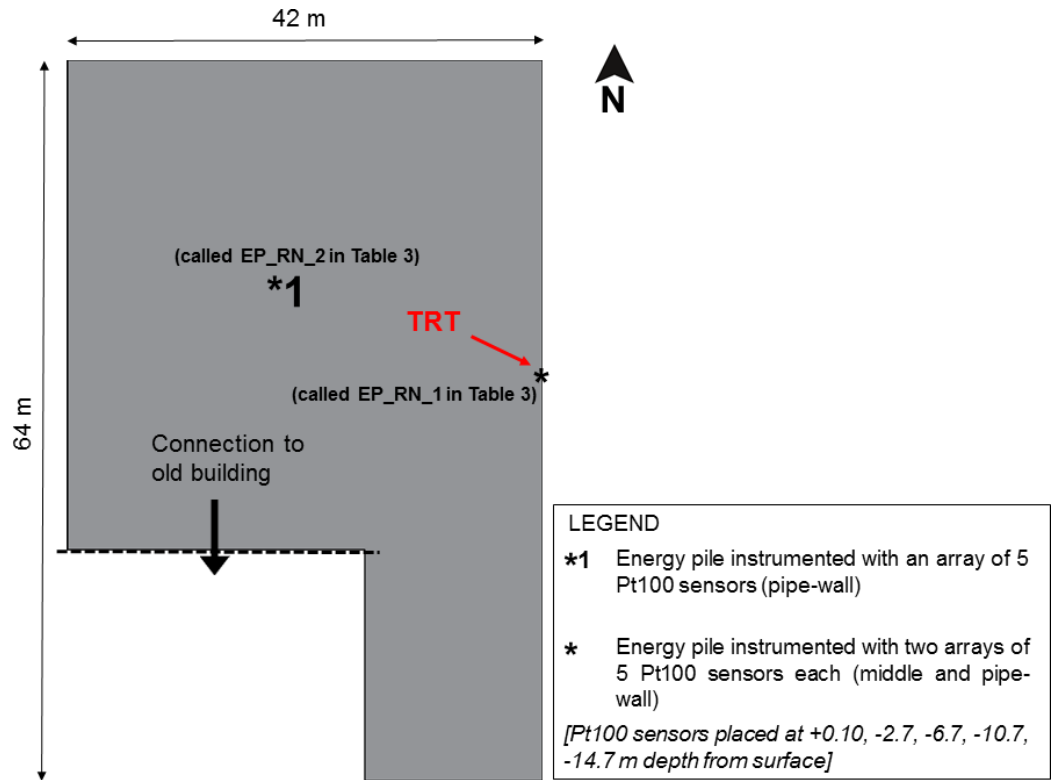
Footprint of the Rosborg Gymnasium's northern extension building. The location of instrumented piles and piles available for testing are also provided.
